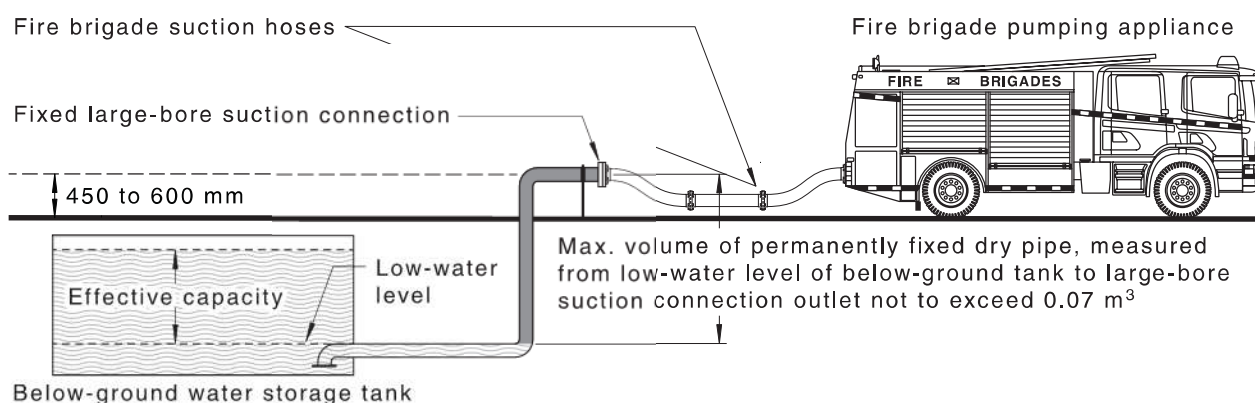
(D) — Maximum volume of fixed on-site dry pipe from a below-ground water storage
